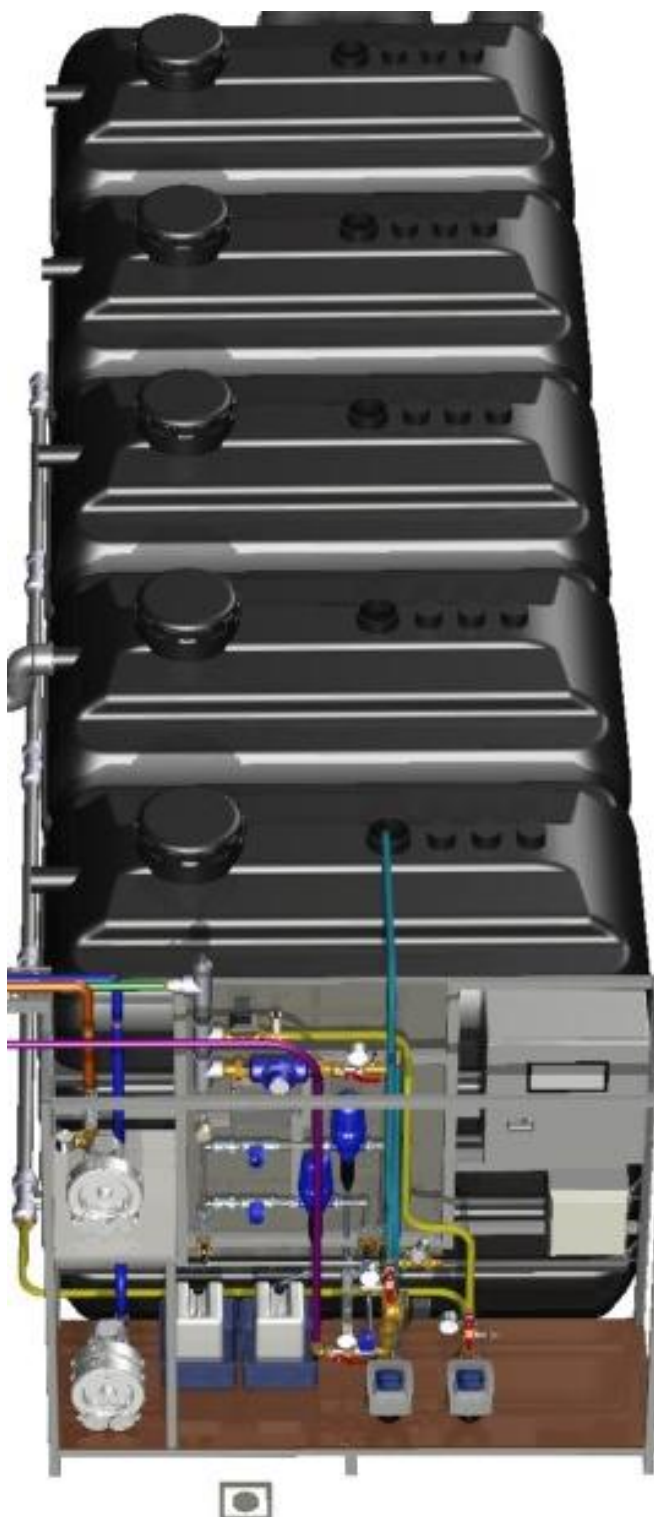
Overview Clear Water Tanks for AL-GW 48600 an Technical unit
